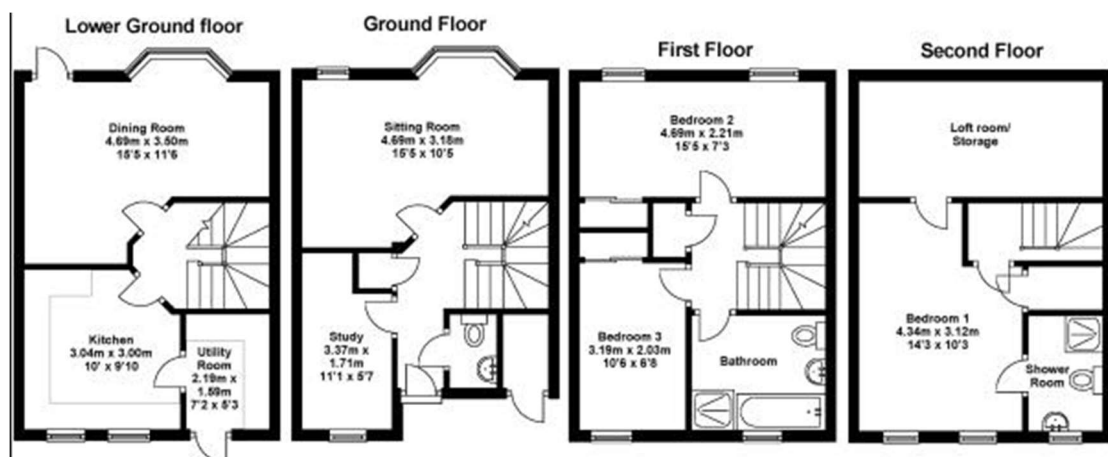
Typical layout (lower ground floor depicted – not applicable to No. 169)
